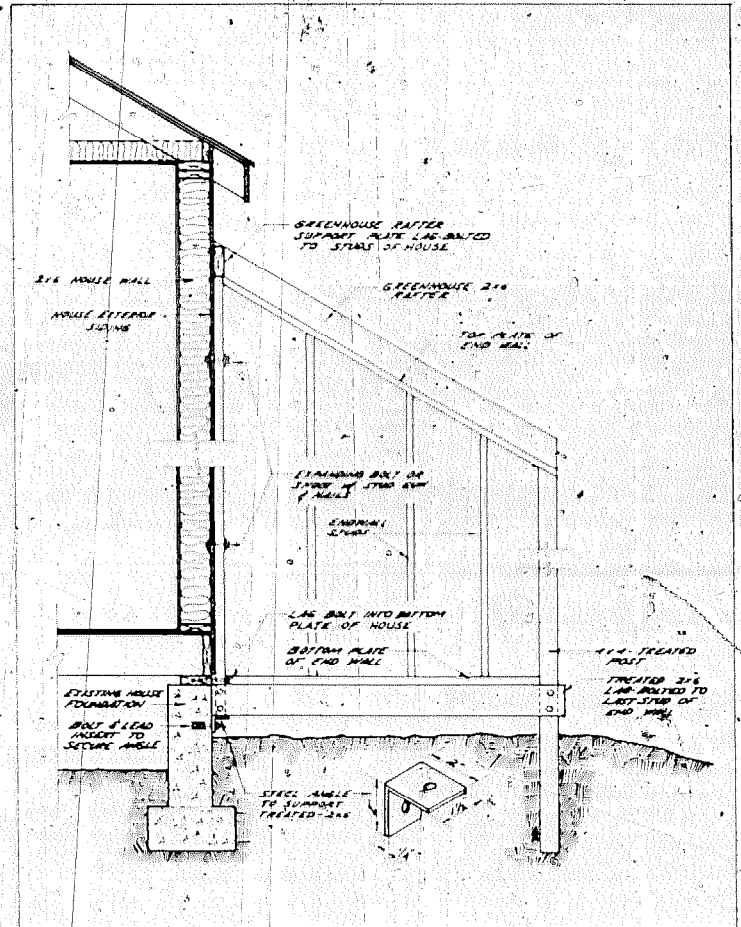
Framing for an endwall of a greenhouse to the house (using a post foundation for the greenhouse)
